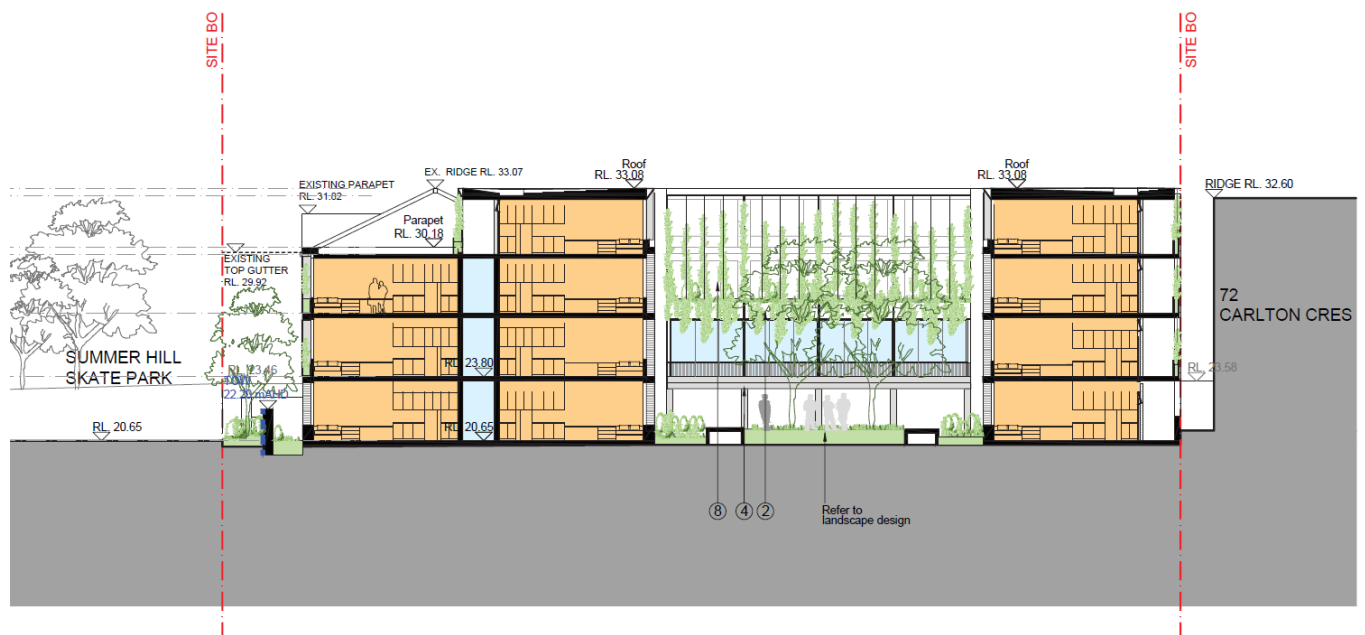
Revised east west section plan showing the flood wall to the western boundary
